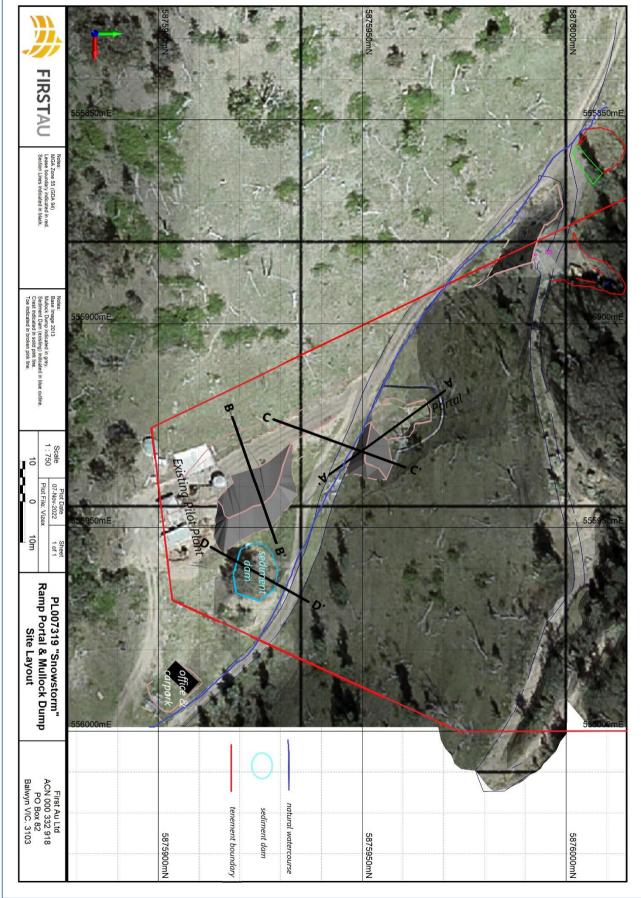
Plan View (detail) of Surface Arrangement (at maximum extent).
